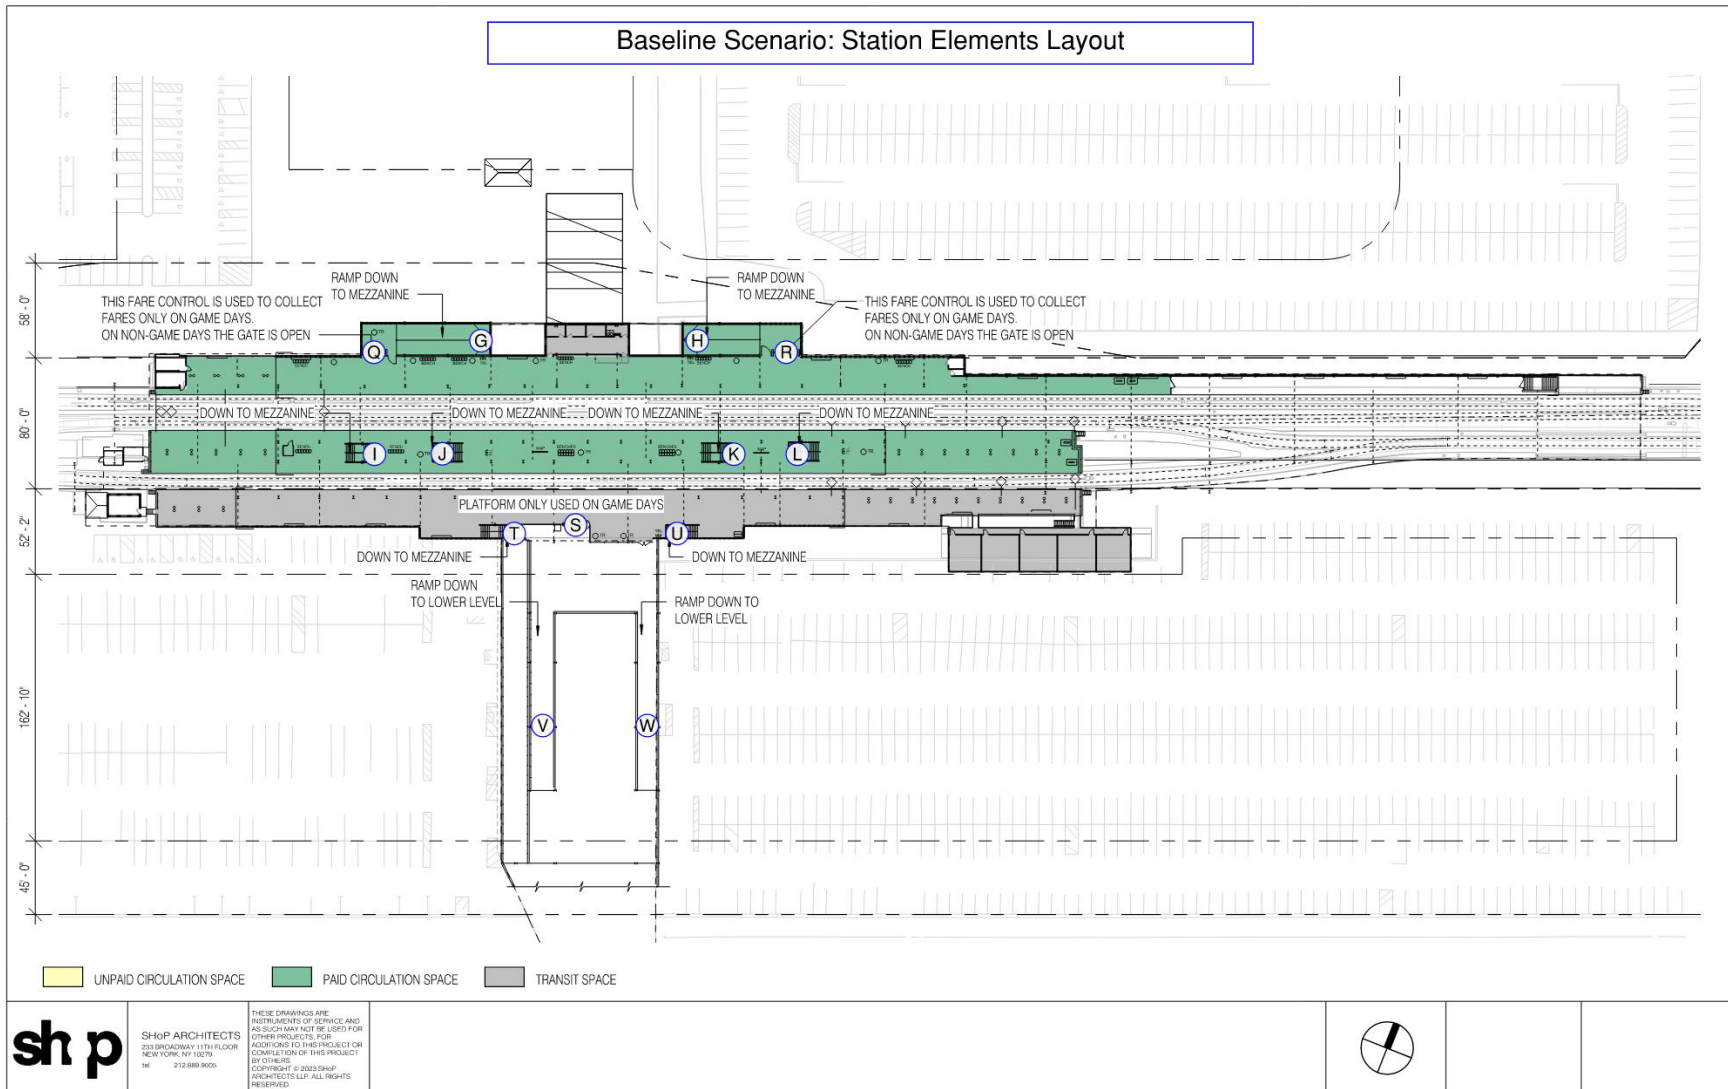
Existing Mets – Willets Point Subway Station Elements – Street Level
